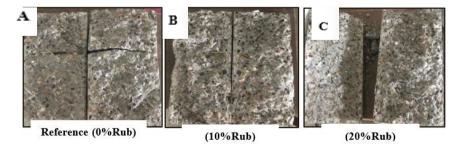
Specimens after splitting tensile test (A) Normal concrete, (b) 10% Rubberized concrete, and (c) 20% Rubberized concrete.
